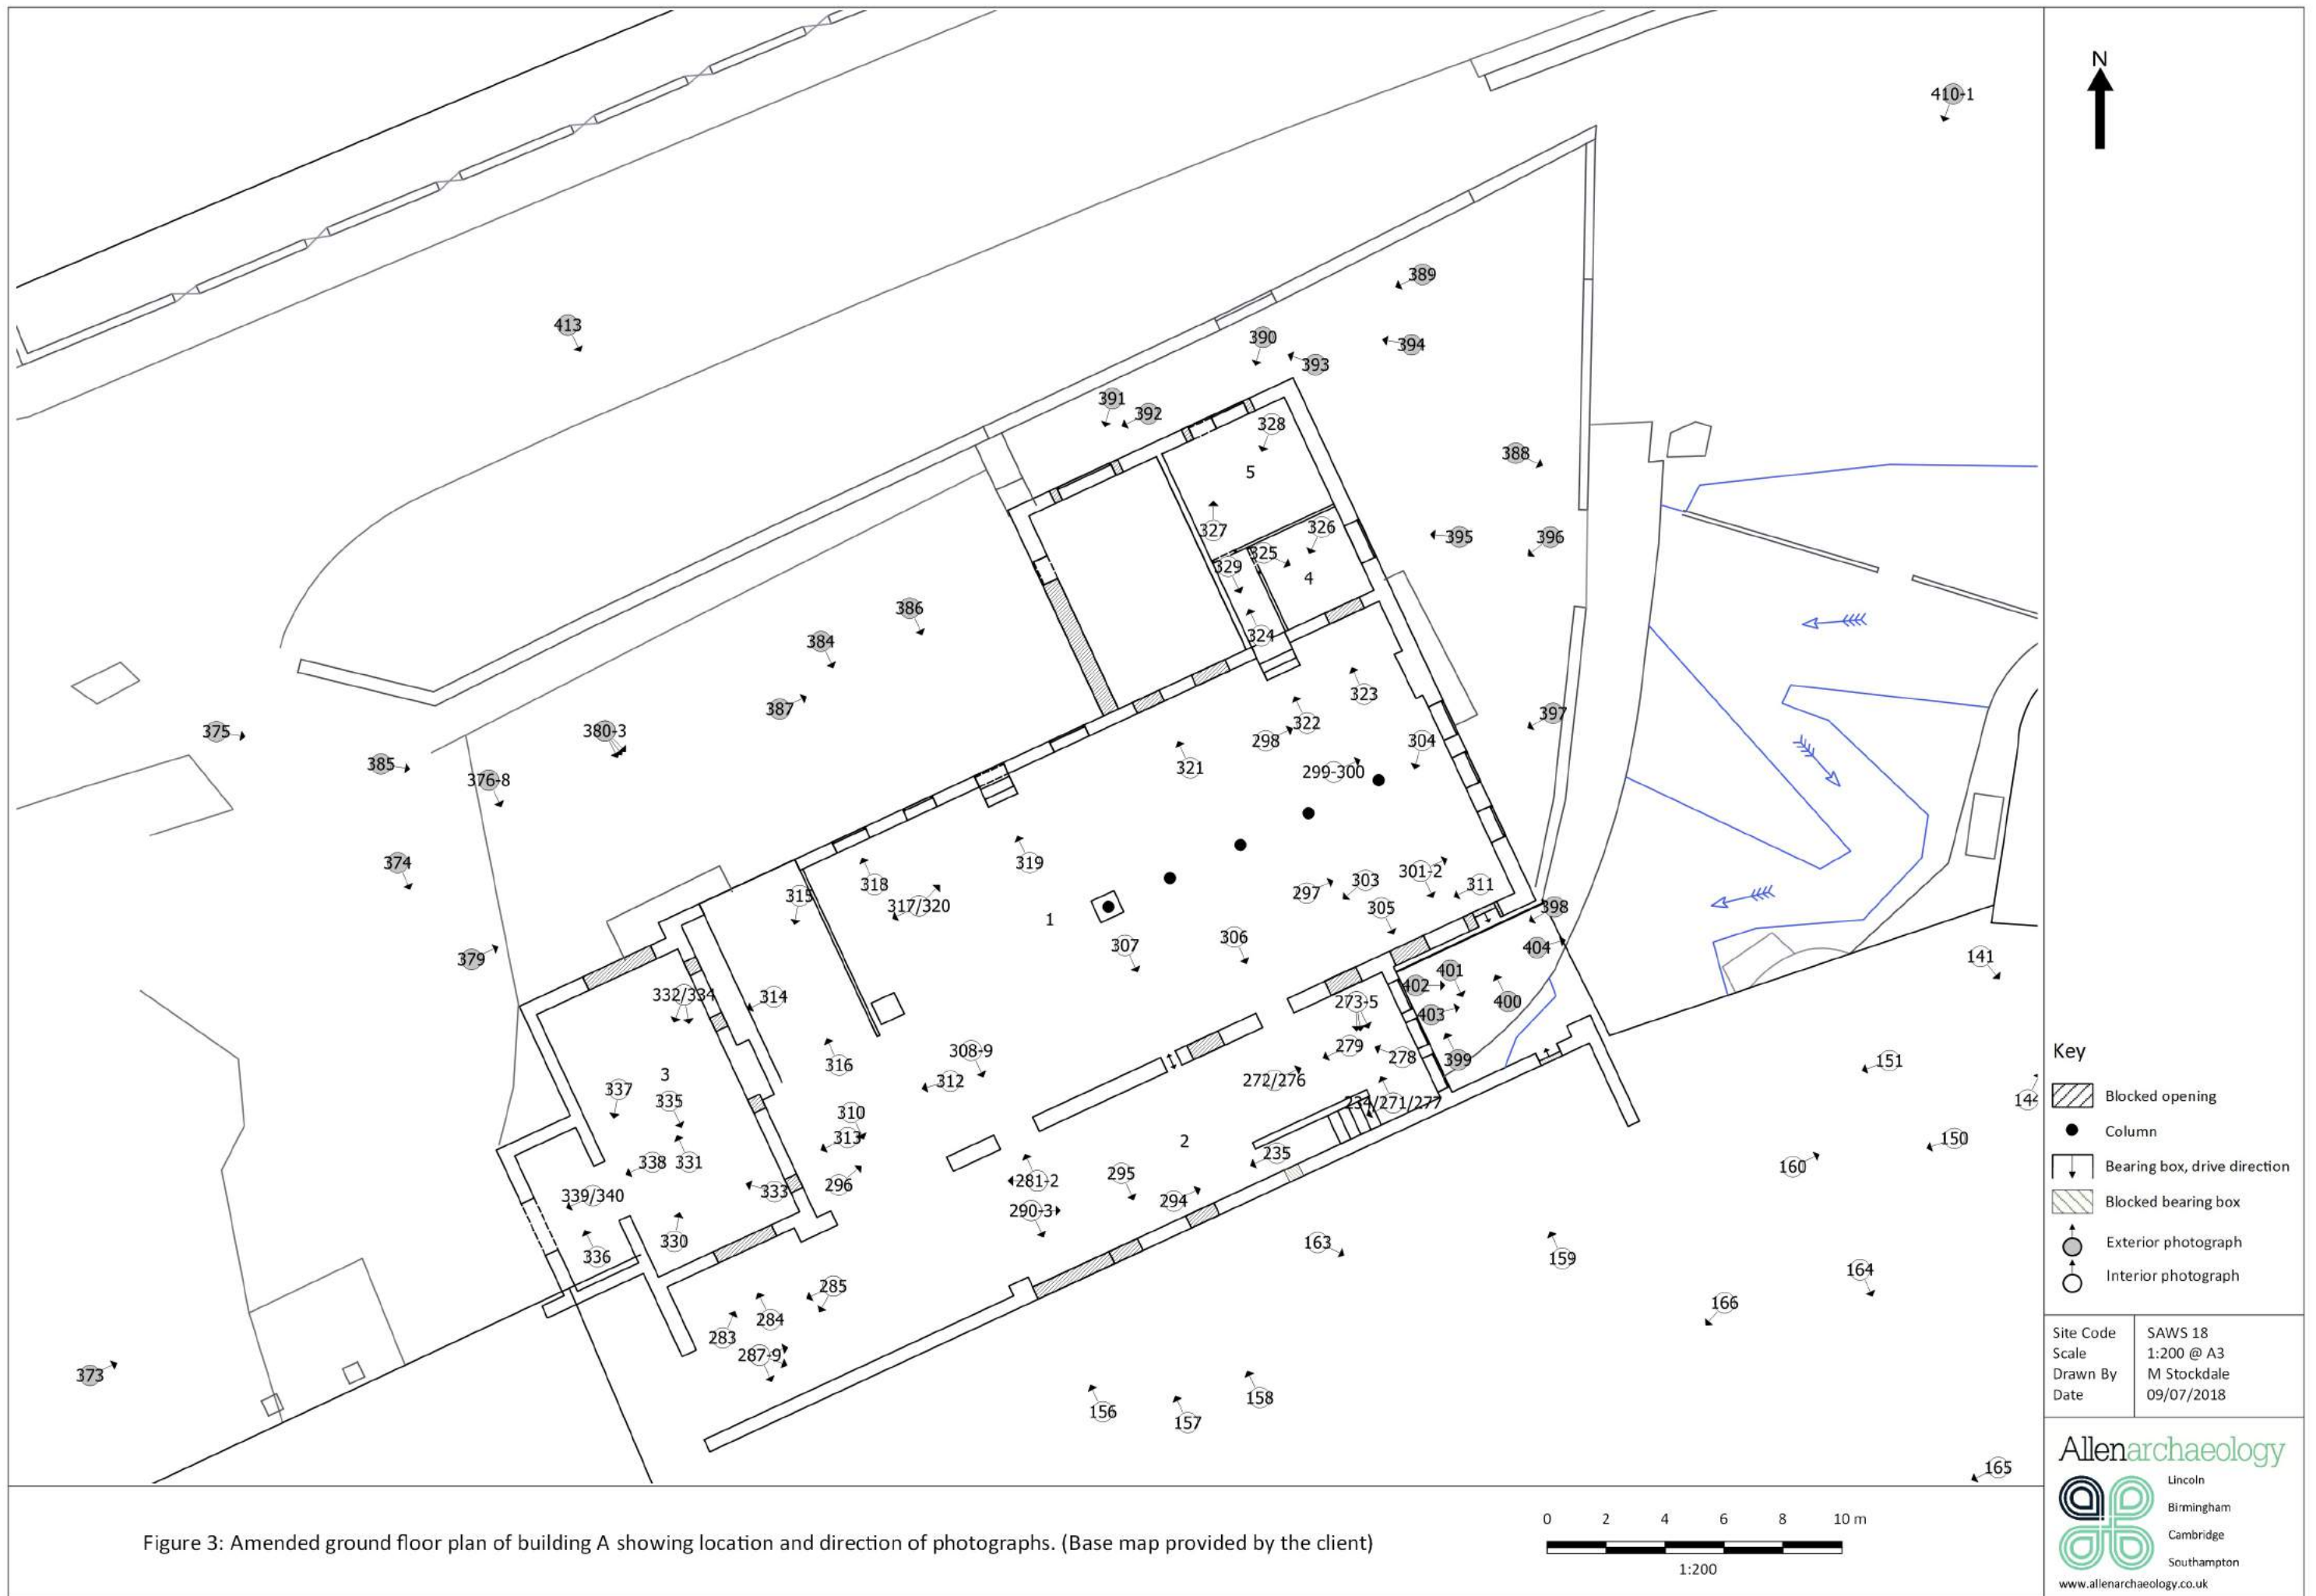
Amended ground floor plan of building A showing location and direction of photographs. (Base map provided by the client)
